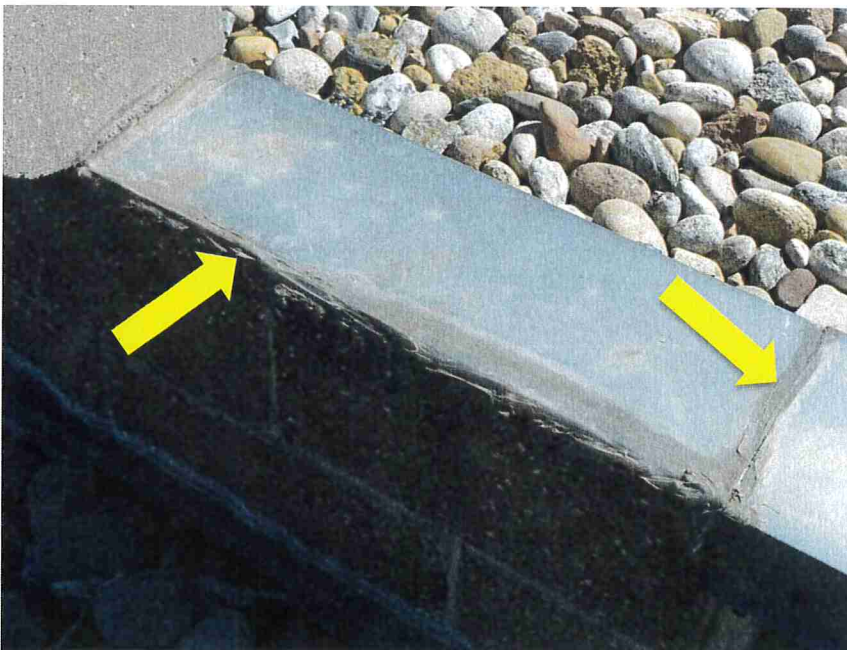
The metal coping did not extend fully over the parapet wall. Sealant was placed at the joints in the coping and along the transition to the masonry parapet wall.
